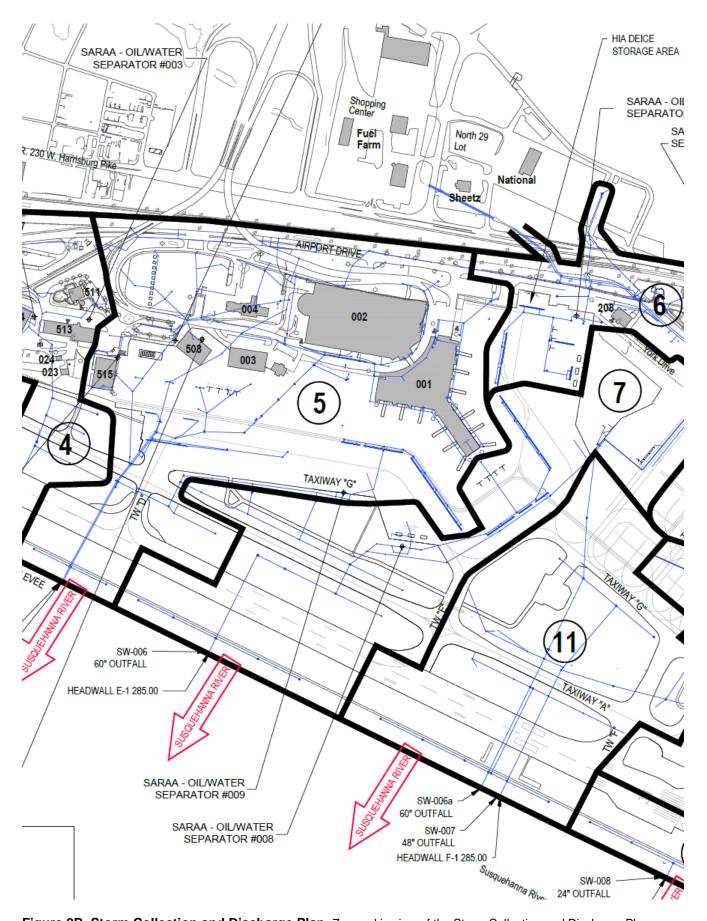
B. Storm Collection and Discharge Plan. Zoomed in view of the Storm Collection and Discharge Plan.
